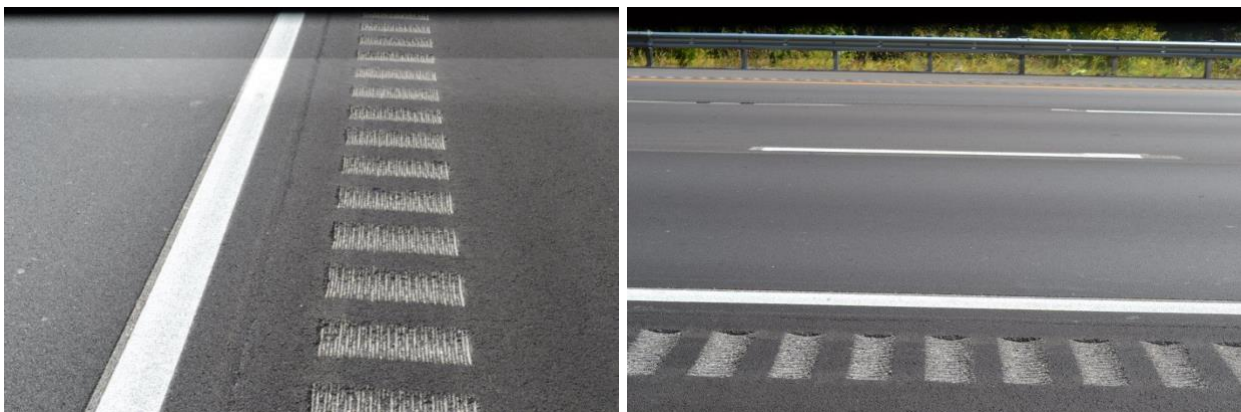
I-75 Recessed Thermoplastic Striping and Shoulder Rumble Strip
